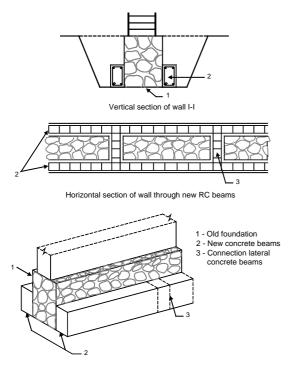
Improving a foundation by inserting lateral concrete beams [25]
